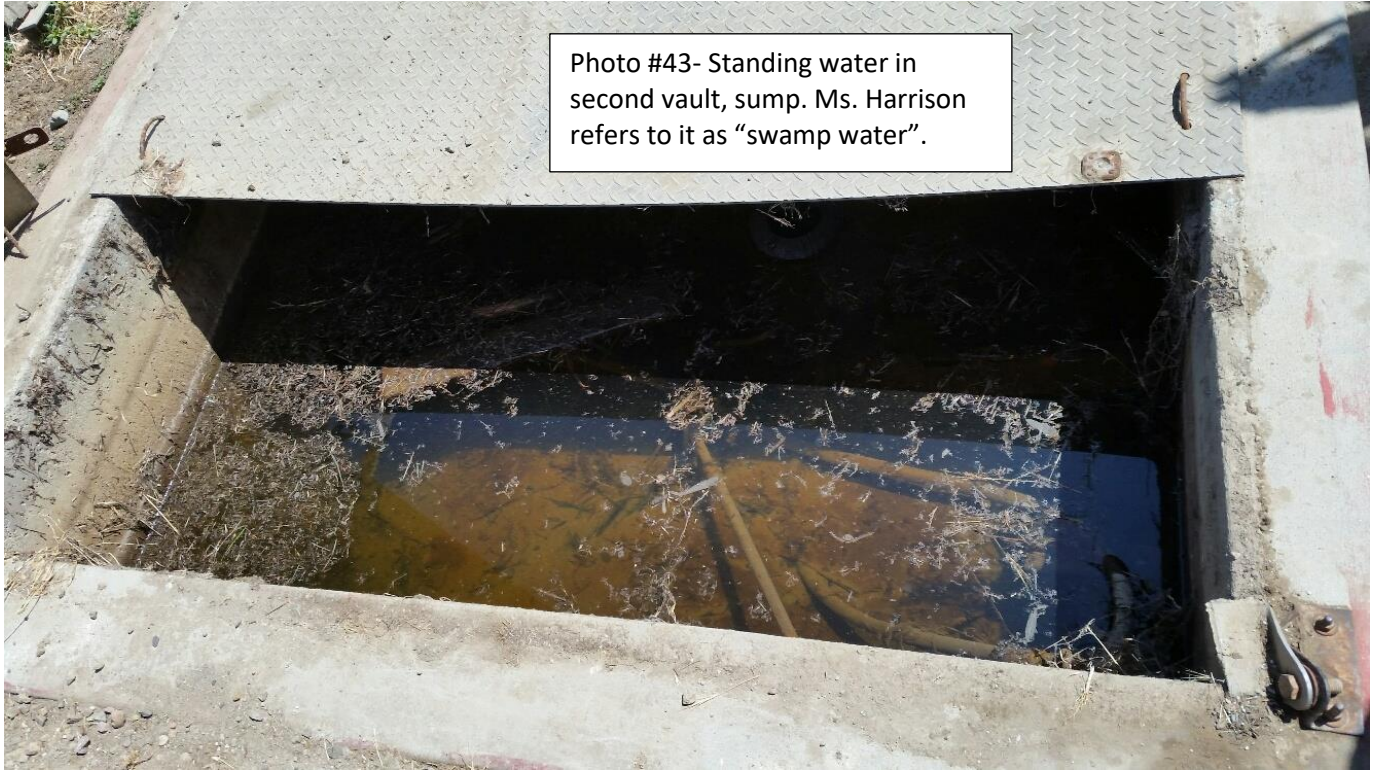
Standing water in second vault, sump. Ms. Harrison refers to it as "swamp water".
